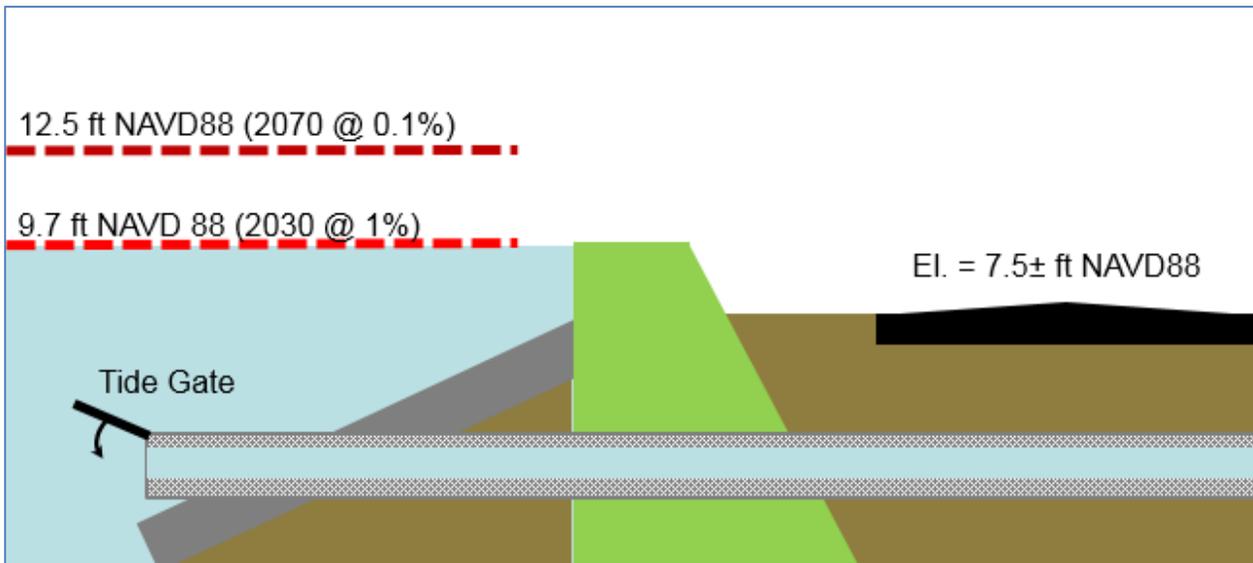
Seaview Avenue at Farm Pond – Phase 1 Sea Wall Construction
